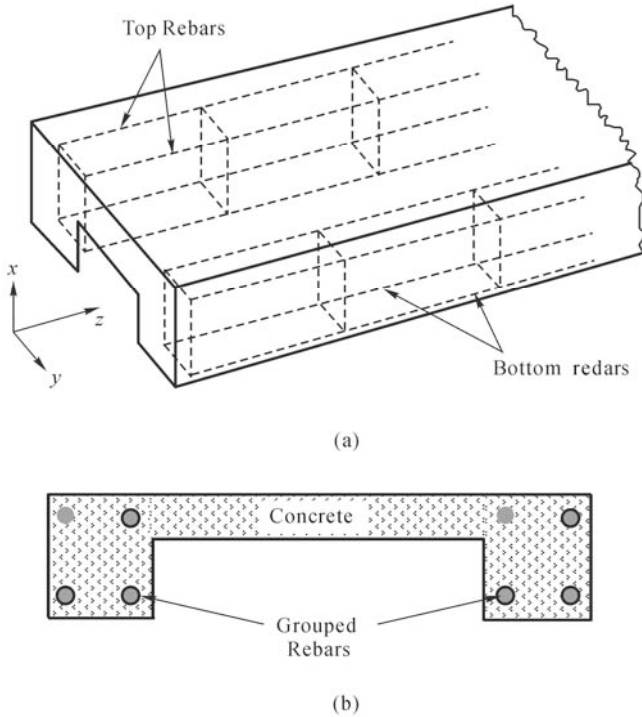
The concrete beam. (a) Isometric view; (b) Cross-sectional view
